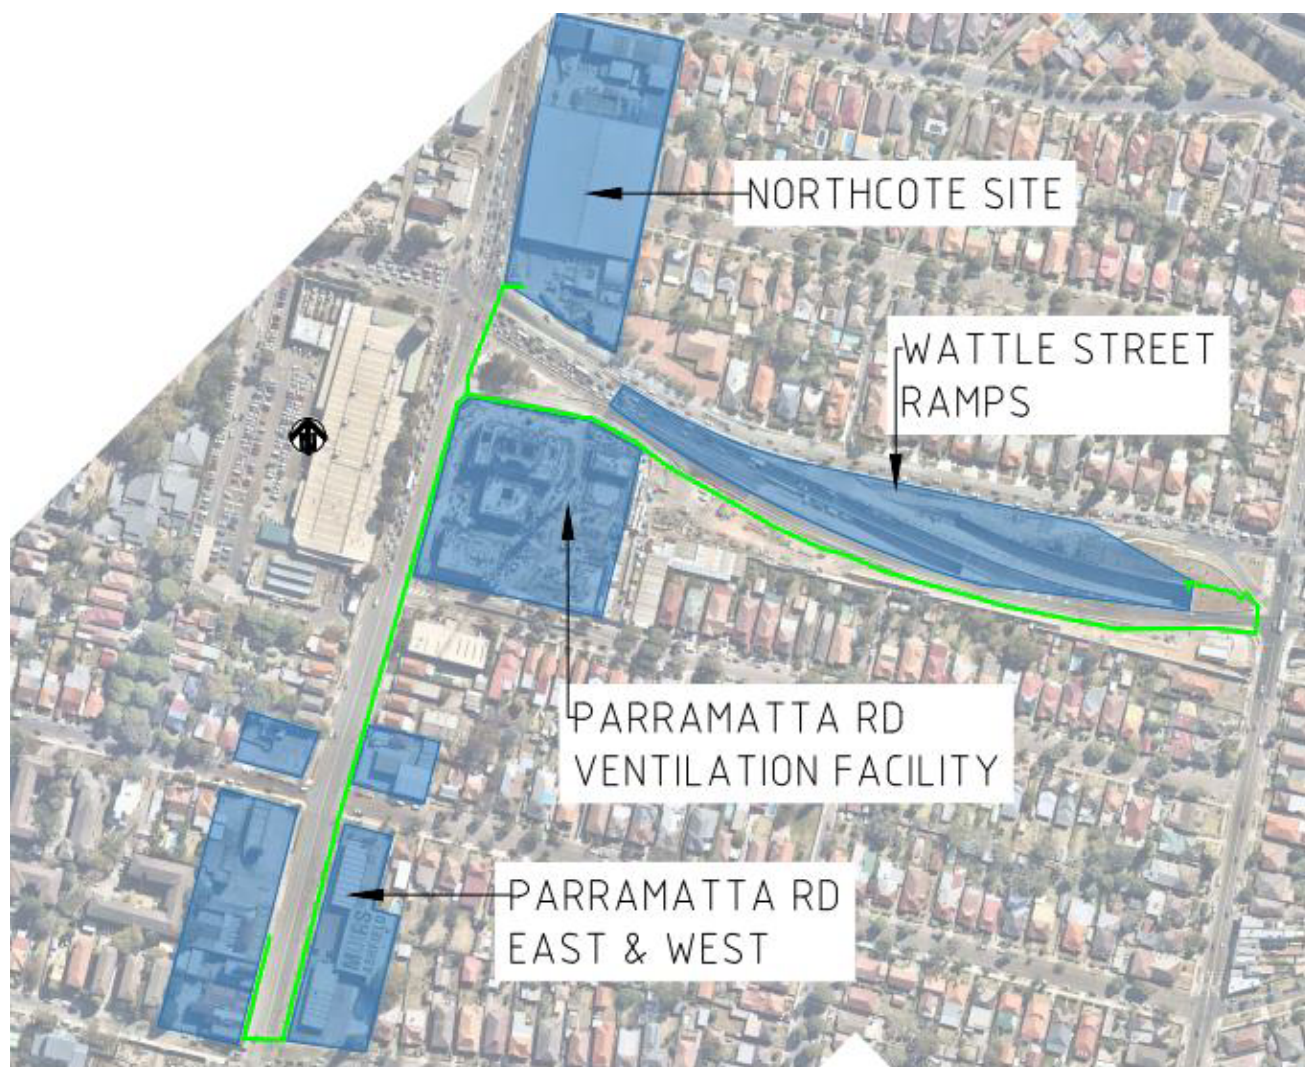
Walking access route (Green line) to the Northcote Site, Wattle St Ramps and Parramatta Rd Vent Facility
